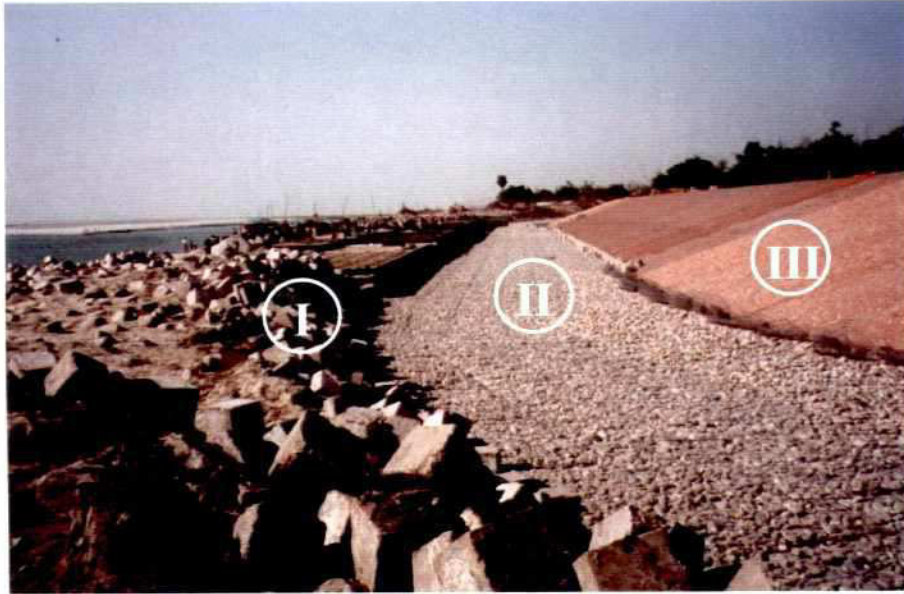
Typical cross section, showing structure components at Ghutail
